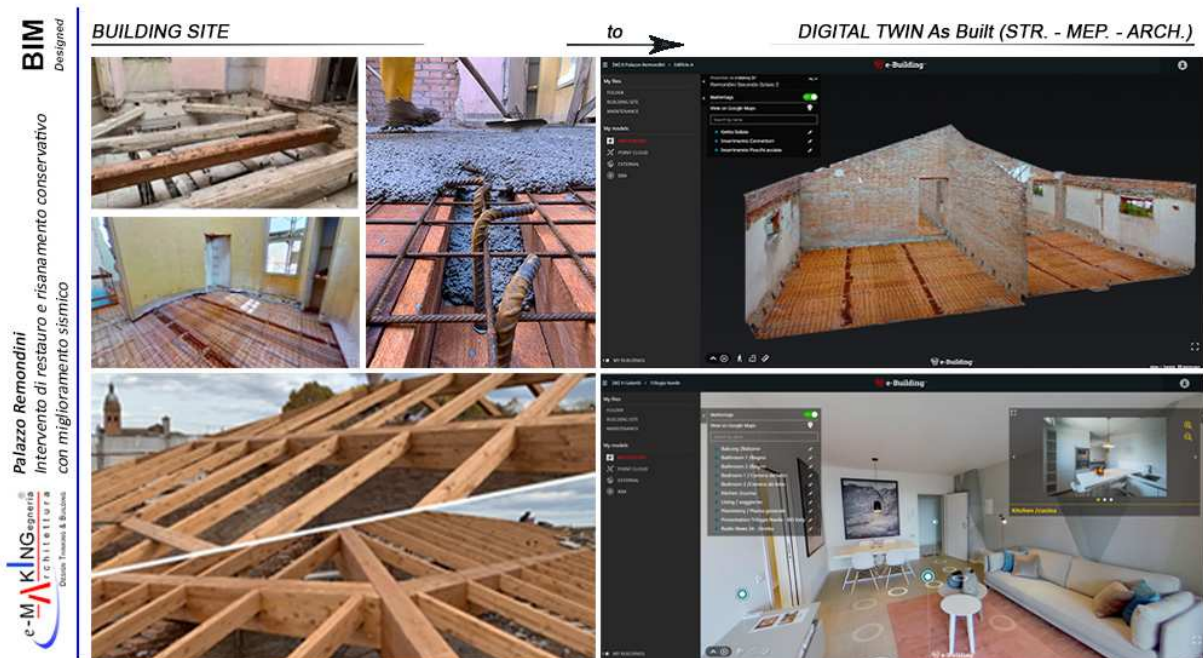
Flow: building site to Digital Twin “as built” (Str. – Mep. – Arch.)
